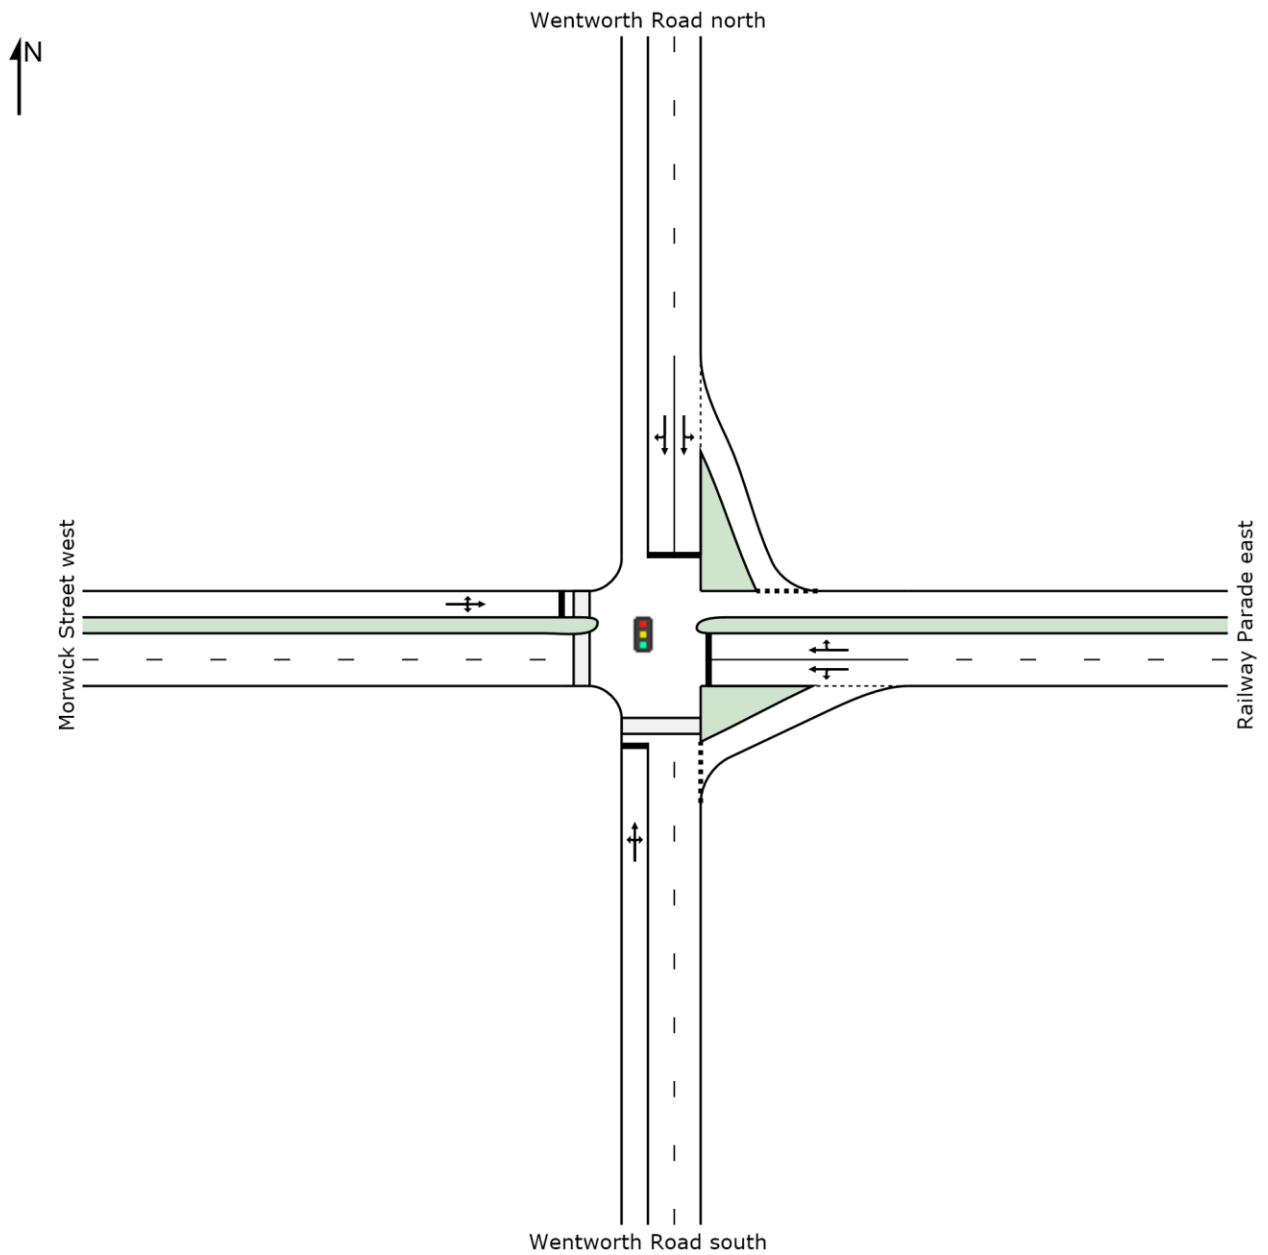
Signalised Intersection of Wentworth Road with Railway Parade with Morwick Street
